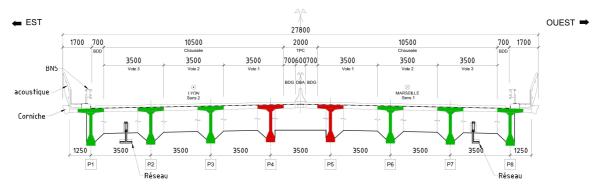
deck cross-section - beams 4 and 5 (in red) have an additional cable, anchored into the top slab.
